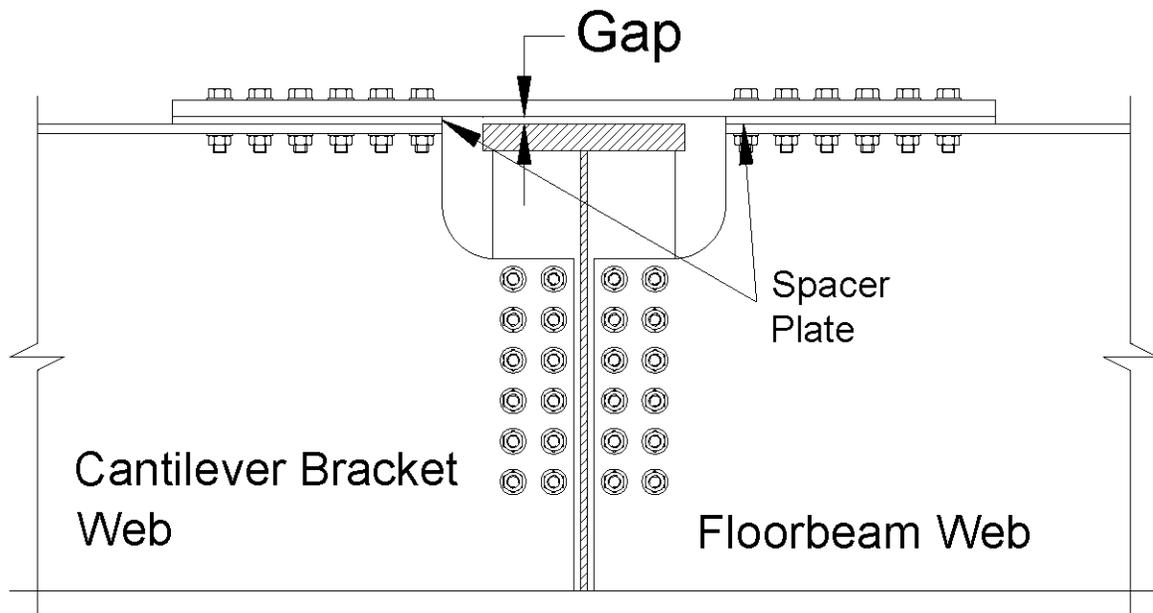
Retrofit of tie plate cracking through addition of spacer plates.
